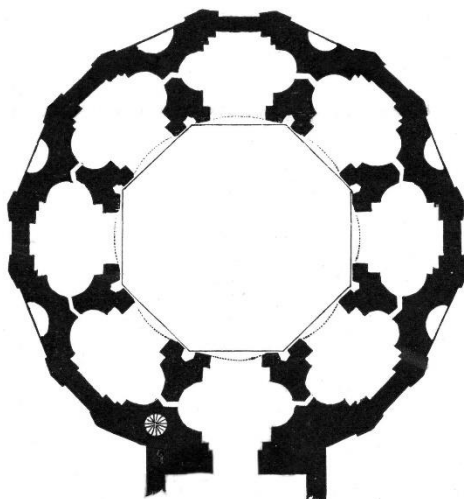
Plan Sta. Maria degli Angeli. 1434-1437 A.D. (INTERFOTO, 2008)
